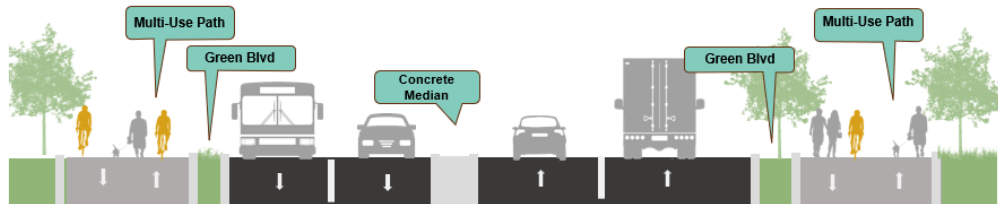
Existing and Recommended Design for The Pond Road to Steeles Avenue West
